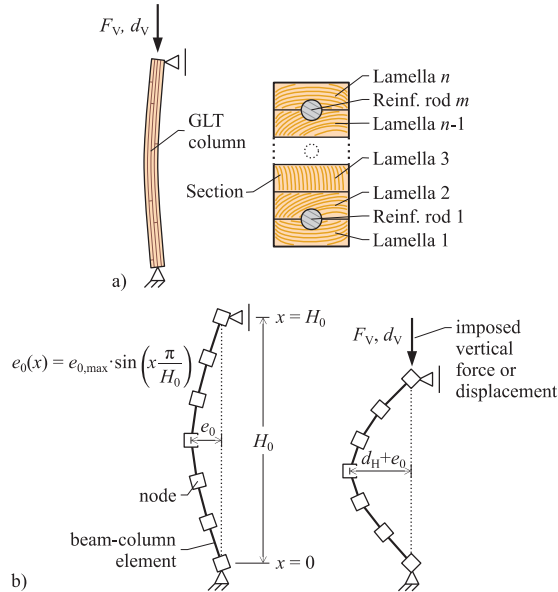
Numerical model of the GLT column: a) idealisation of the column and cross-section; b) FE model, including initial deformed shape.
